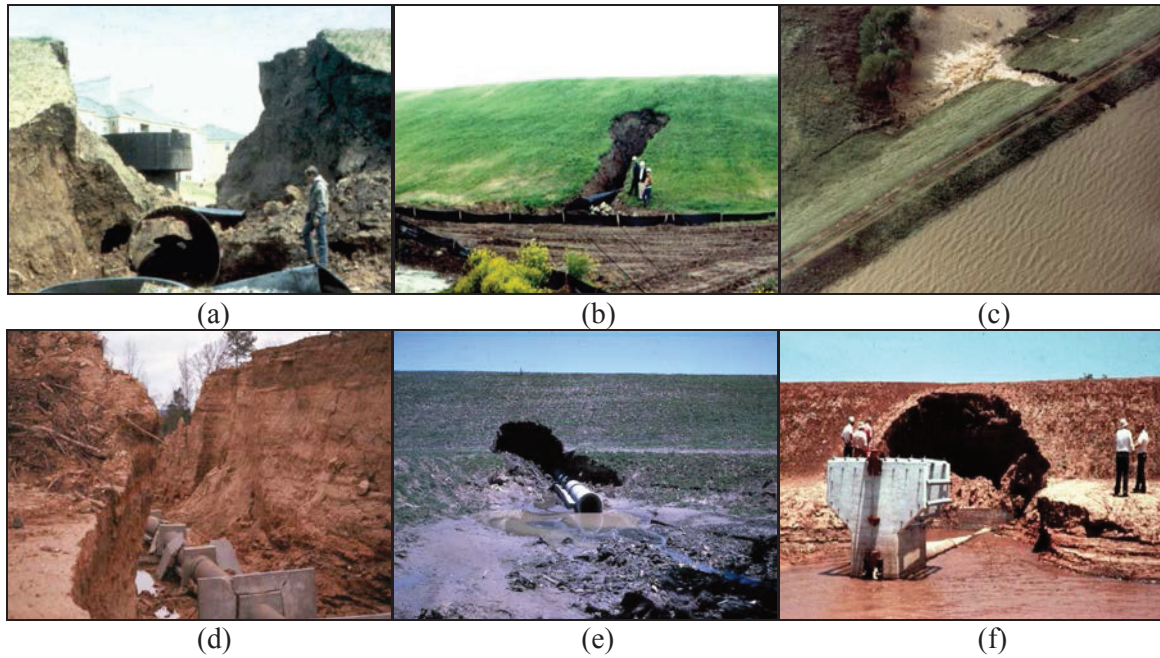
Some dam failures due to piping around buried conduits: (a) Loveton Farms Dam; (b) Medford Quarry Wash Water Lake Dam; (c) Upper Red Rock Site 20 Dam; (d) Anonymous Dam 1; (e) Anonymous Dam 2; (f) Anonymous Dam 3
